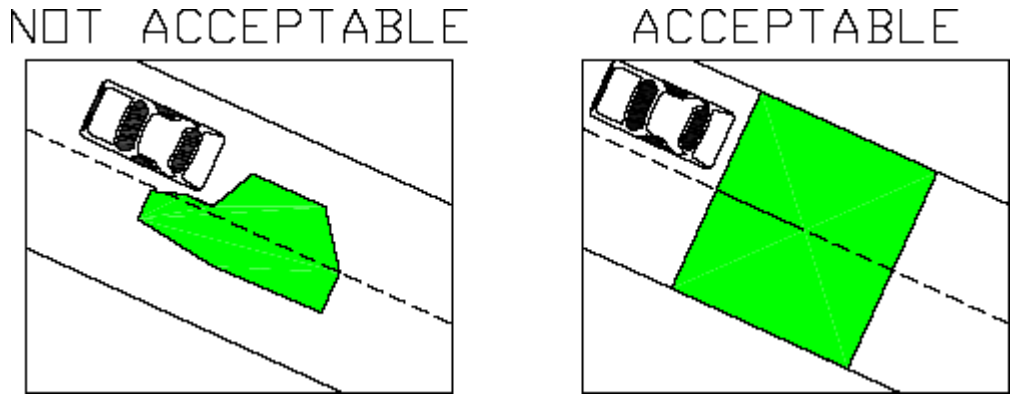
Example 1: Do not construct patches with angled sides and irregular shapes.
